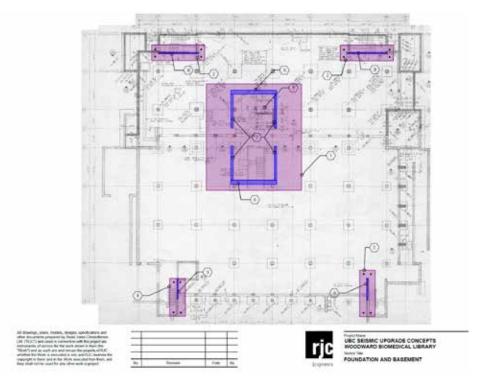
Woodward Building – Concept retrofit diagram at foundation level
